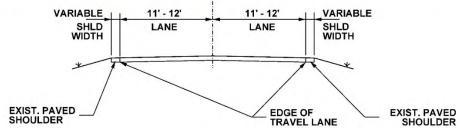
Mining Segment - SH 12 Typical Section Location Near MP 50
